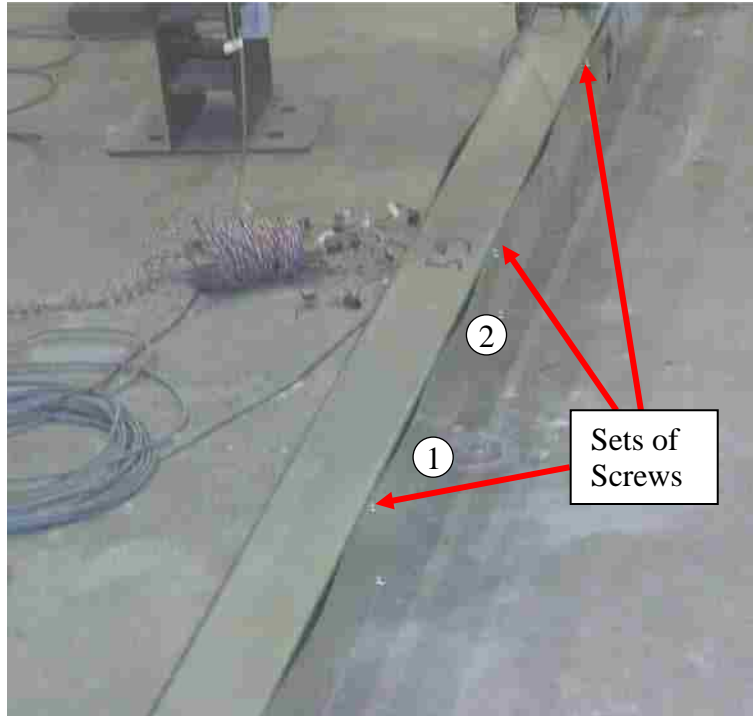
Photo of Local Buckling in “Adhesive and Screws” Column During Test to 20 kips Showing Two Wavelengths Between Sets of Screws
